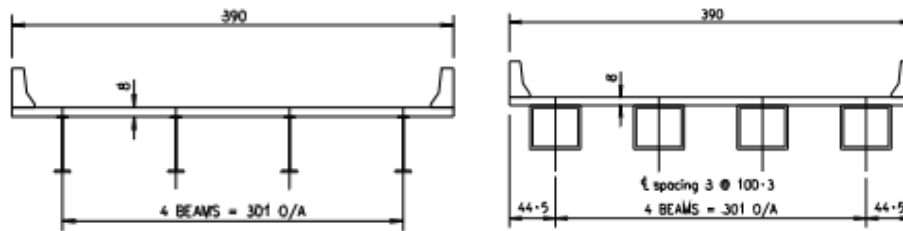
Jempson tested superstructure cross-sections: A-left, and B-right
